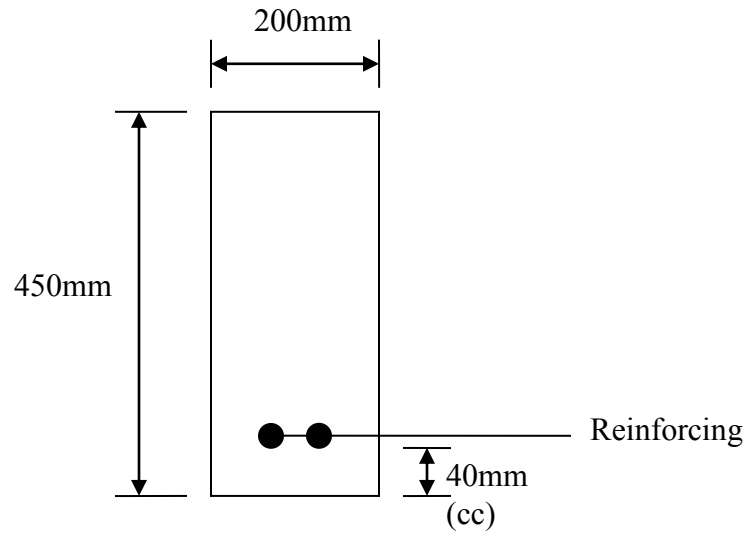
General cross section of wood-formed concrete curve beam at the centre
